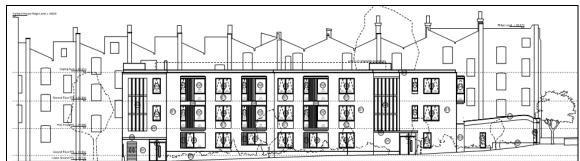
Front elevation of proposed building facing south from Windsor Street
